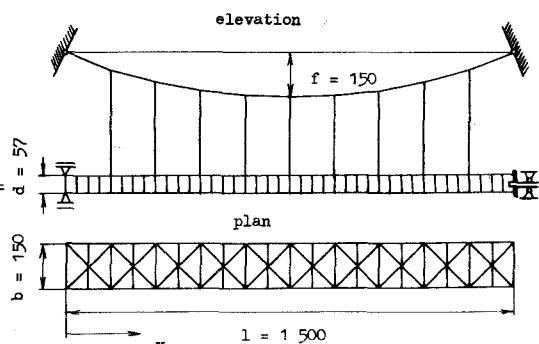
Four-walled suspended structure built up with two stiffening plate girders and two horizontal trusses.
